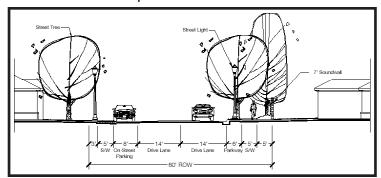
Collector Street w/Soundwall on 1 Side-Woodbridge by Del Webb, Section S
